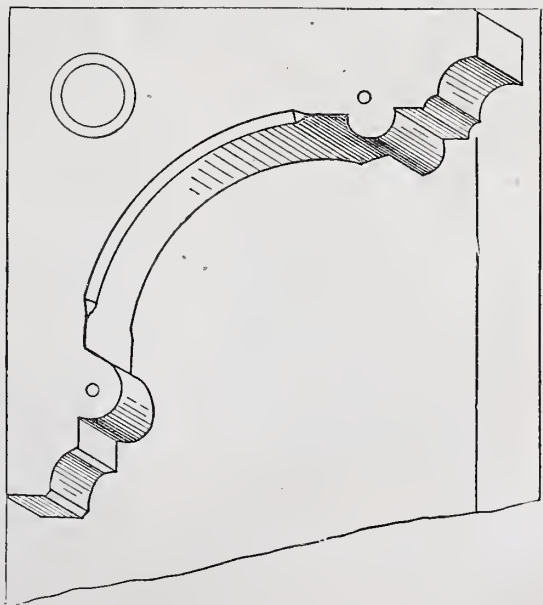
Bracket at Angle of Bay on Side Elevation.—Scale, $\frac{3}{4}$ Inch to the Foot.
